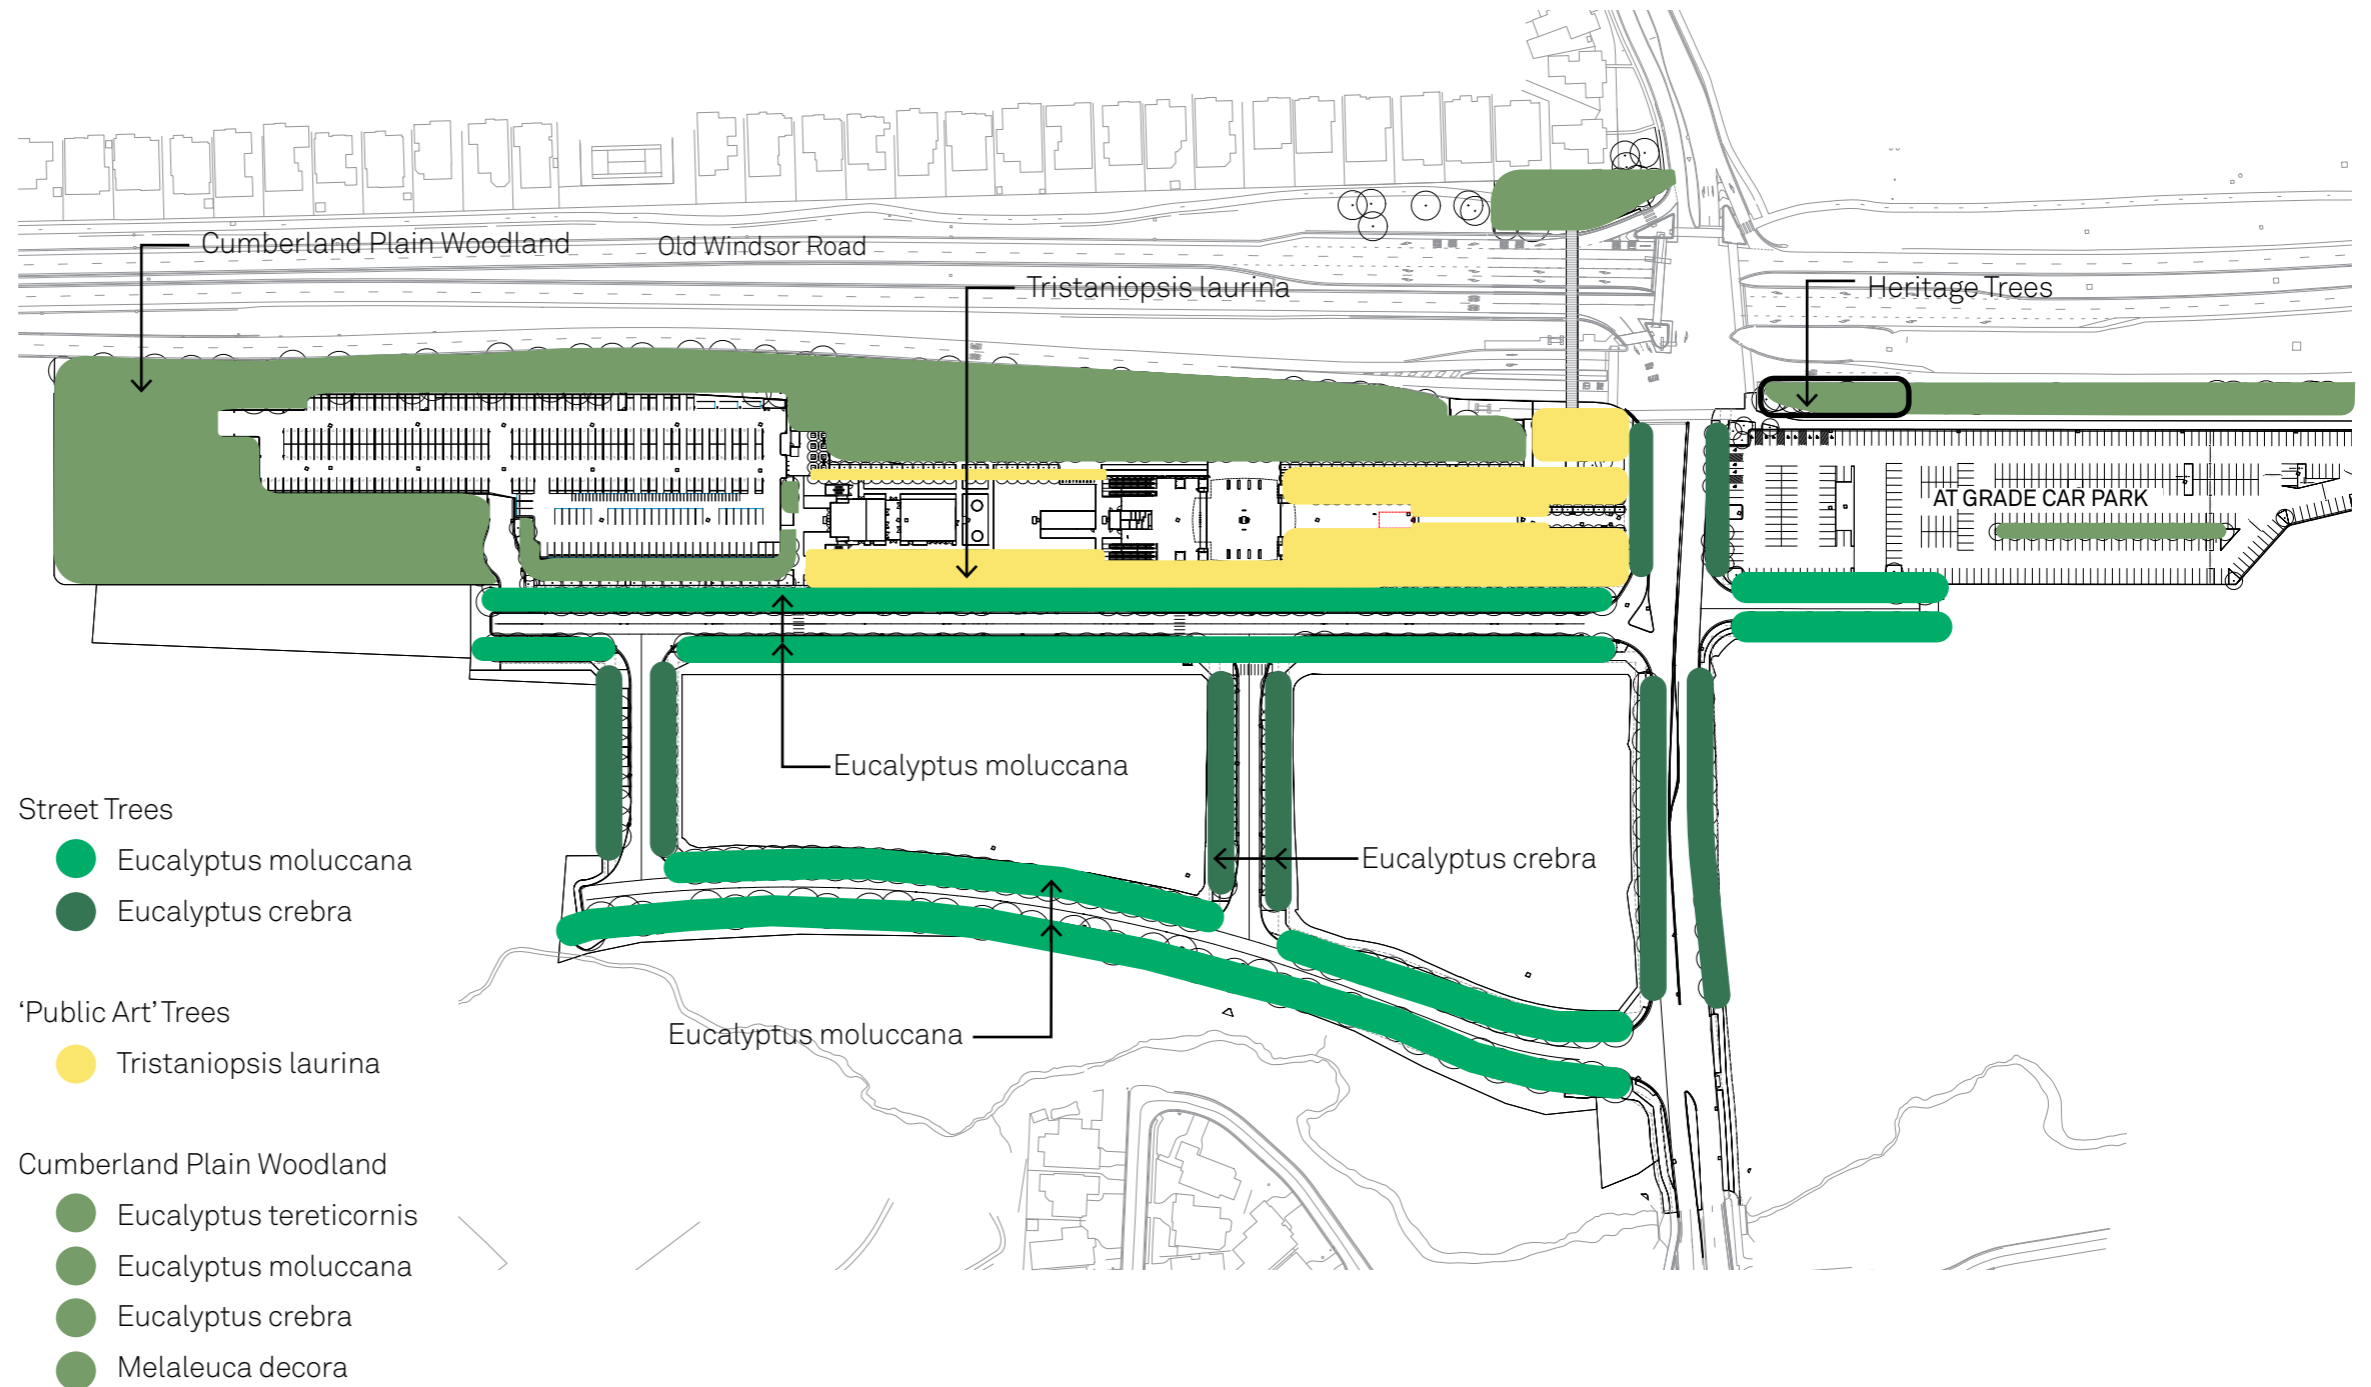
KVE\_Kellyville Station Precinct Planting Plan. Source: HASSELL.
